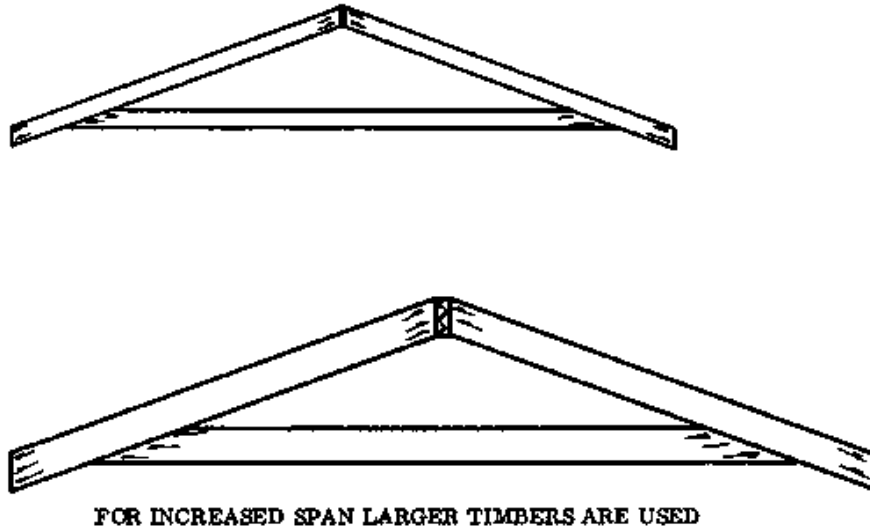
TRADITIONAL ROOF CONSTRUCTION
